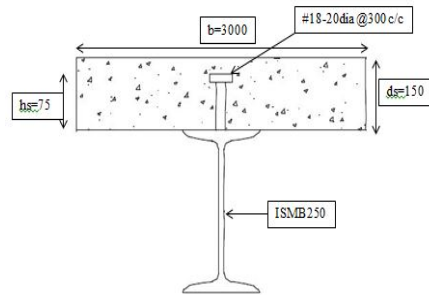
Fig VII: Typical c/s of Composite Beam in Grid A-B, 1-2
